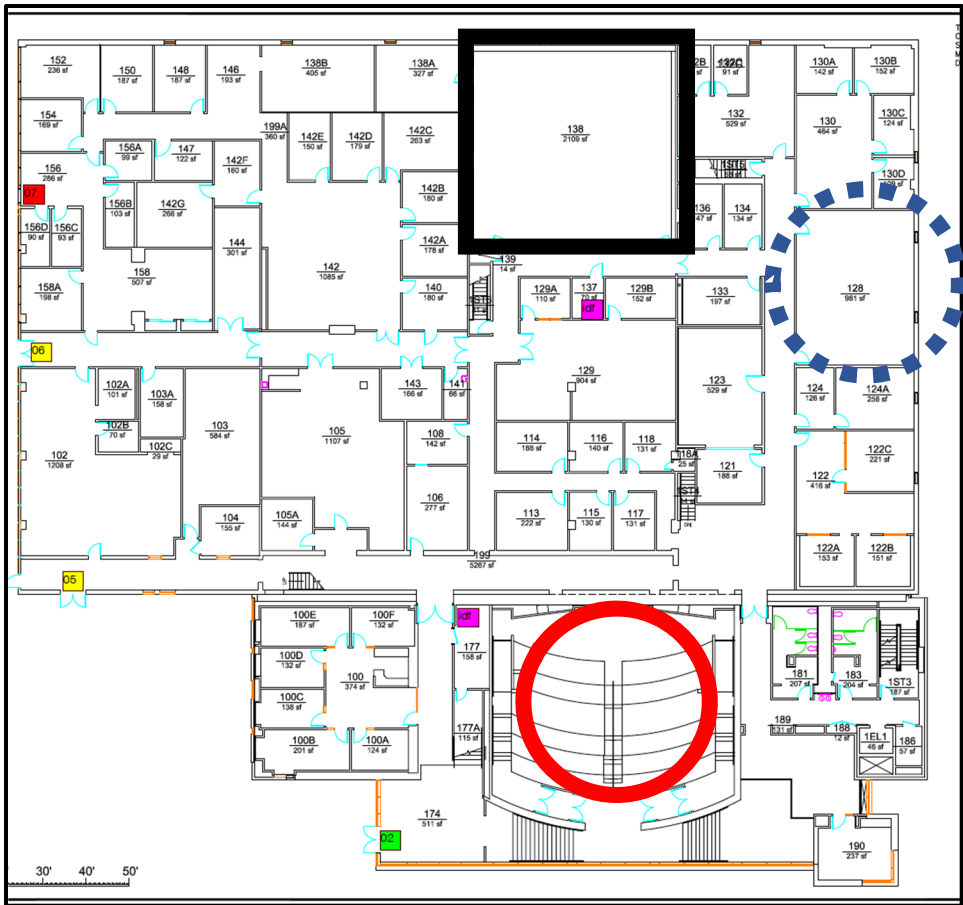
Freeman 1F Floor Layout with Classroom Locations
